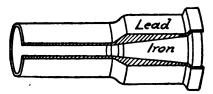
Ferrule for Connecting Bath Waste to Closet Tee.
